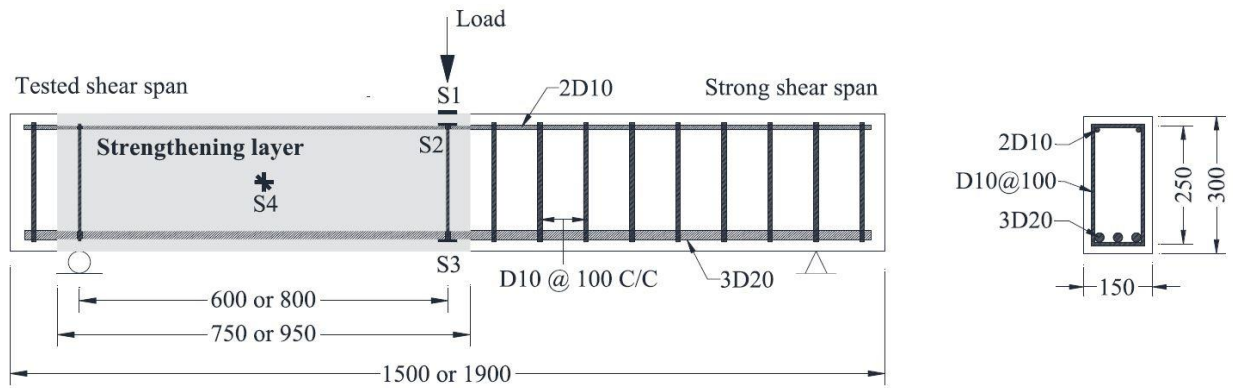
Beam dimensions and reinforcement details (Yang et al. 2020)
